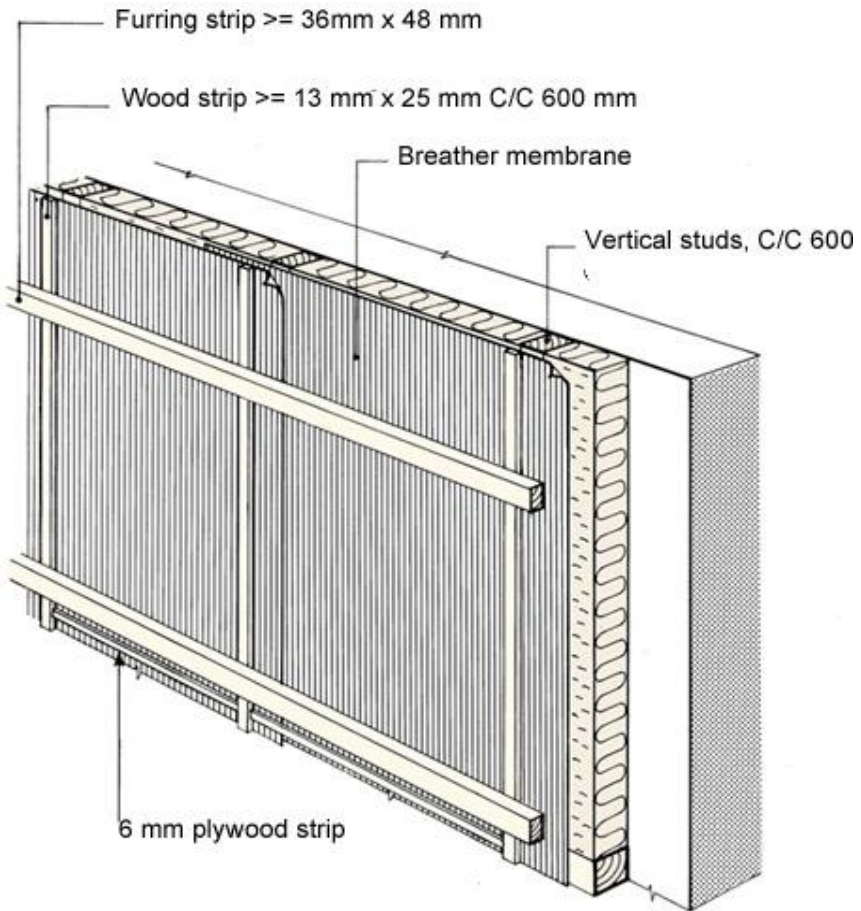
Retrofitting external insulation on a concrete wall. In this example the studs are vertical and wall will receive a ventilated wood siding (Kvande 2003).
